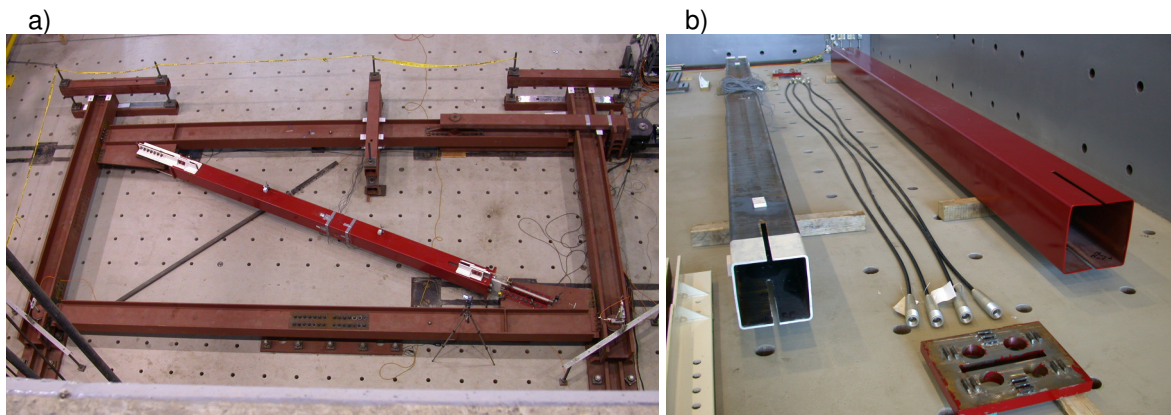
SCED brace prototype: a) Full-scale frame test setup; b) Upon assembling.
